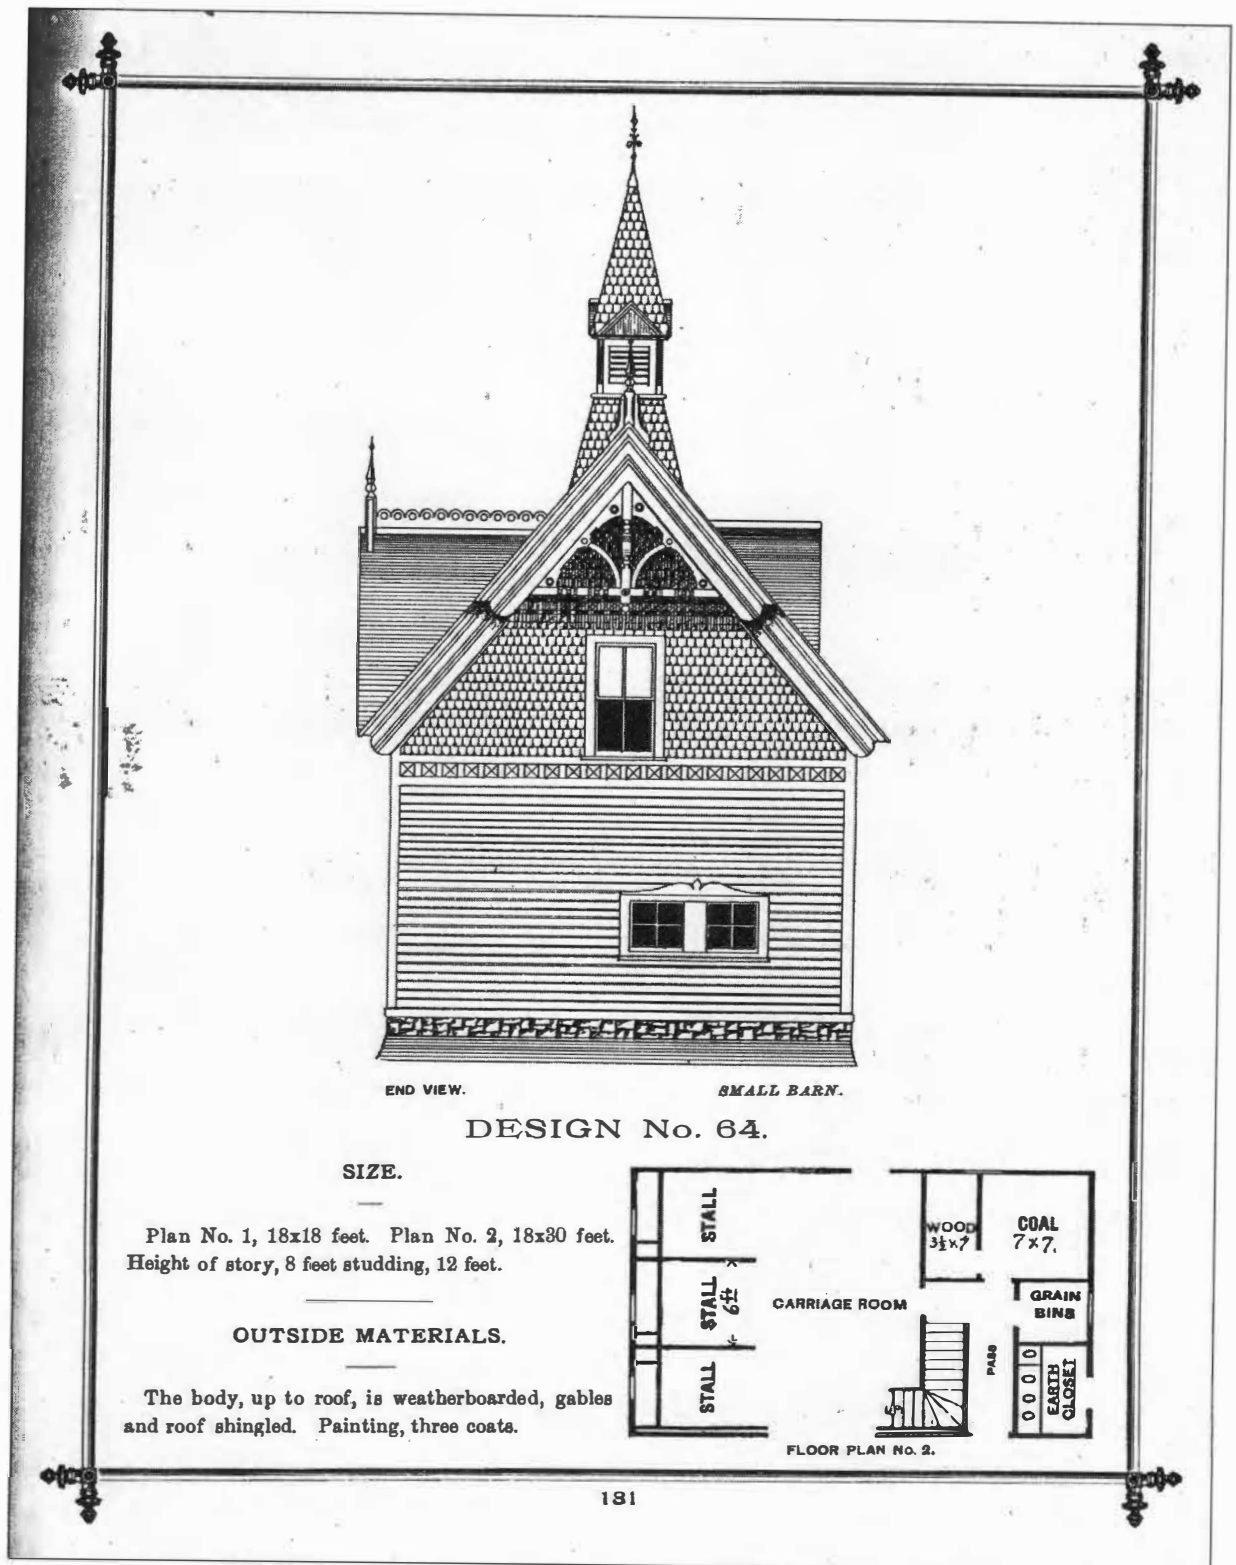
Design No. 64, rear view and floor plan no. 2 (Barber 1891).
